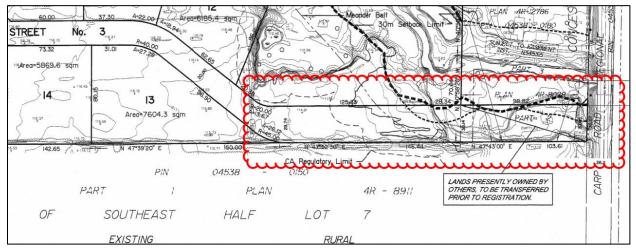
Excerpt from the approved Draft Plan of Subdivision showing the original alignment of Street No.: 3 to Carp Road. Note the original alignment has been emphasized with a markup by Novatech.
